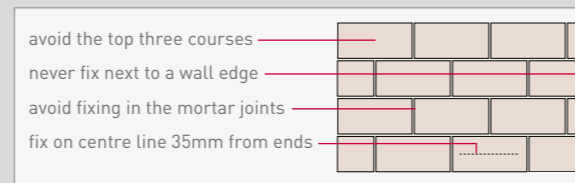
is a useful indicator of where to locate fixings within a blockwork wall. It may be used at the design stage, during construction, as well as after the building has been occupied.
